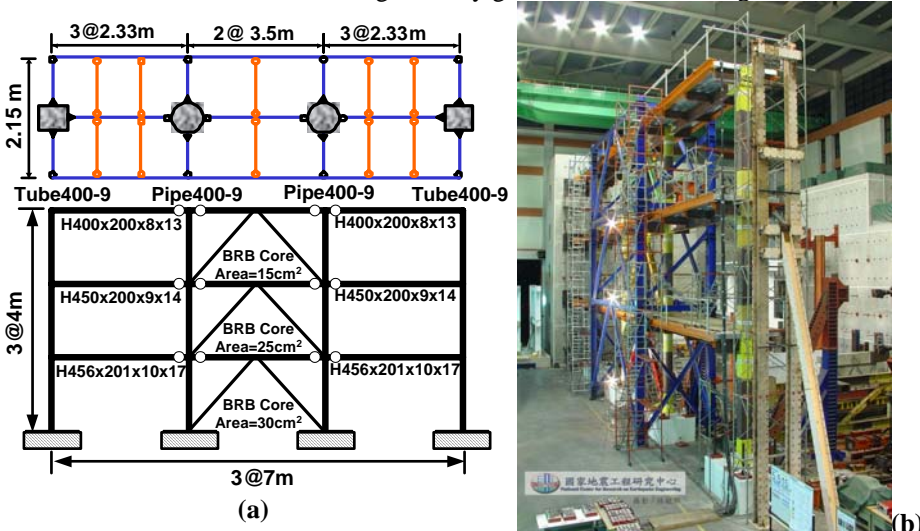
(a) Plan and elevation of the full-scale CFT/BRB composite frame (b) Photo of the CFT/BRB test frame.
